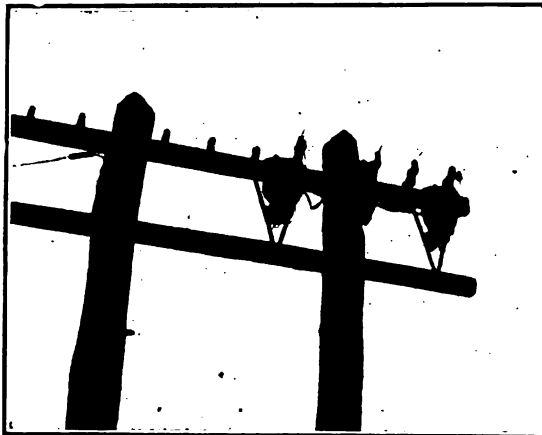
Loading coils placed on an open wire line on "H" Fixtures
